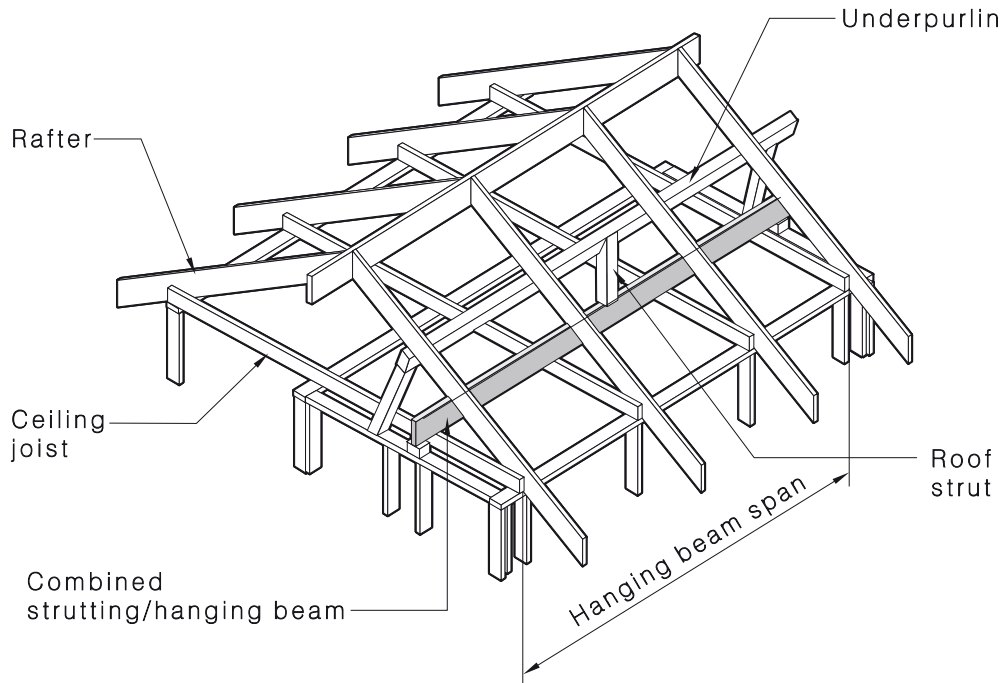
COMBINED STRUTTING/HANGING BEAM
